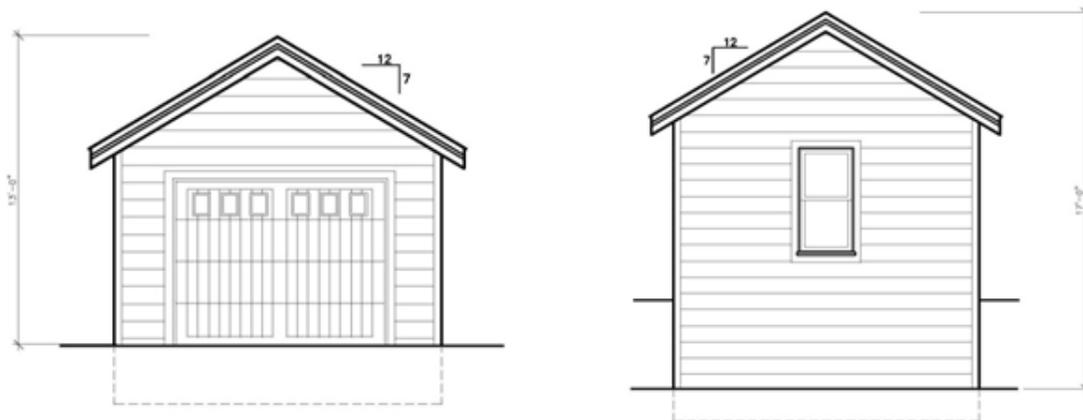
Proposed west elevation (left, facing 6th St.) and east elevation (right, interior lot)
